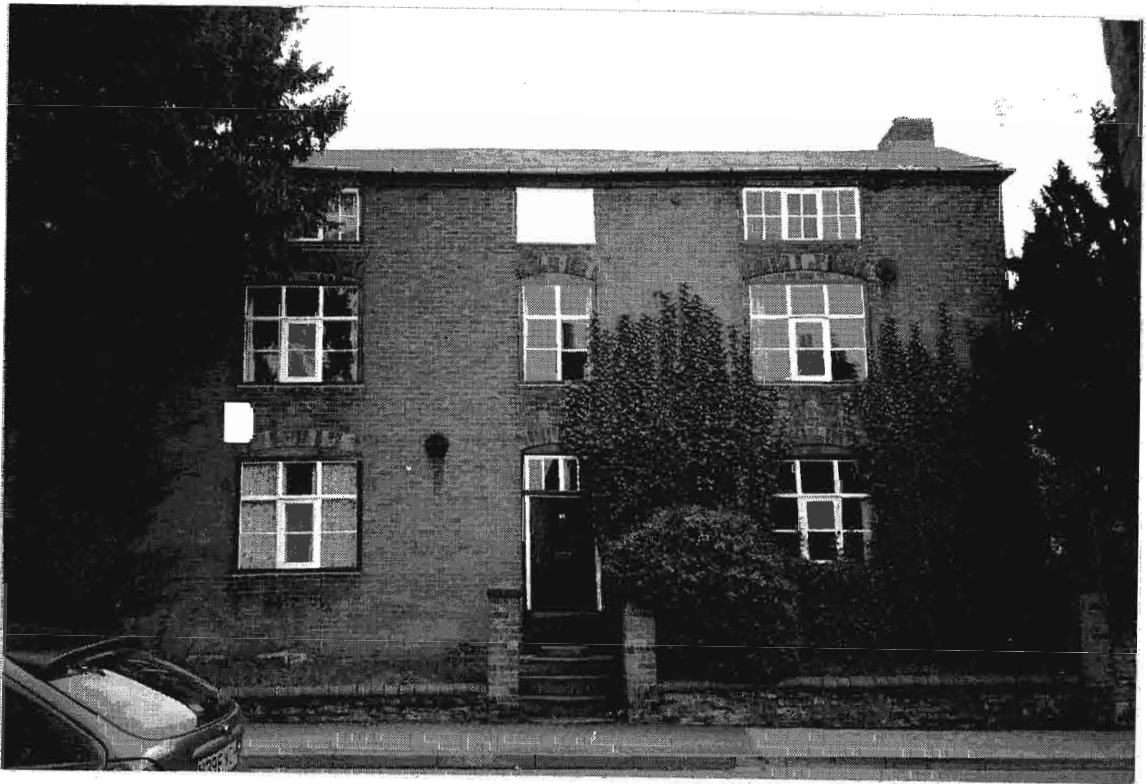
Ravenstone Farm, Higham-on-the-Hill, main elevation, showing series of blind, segmental arched windows at ground and first floor levels.
